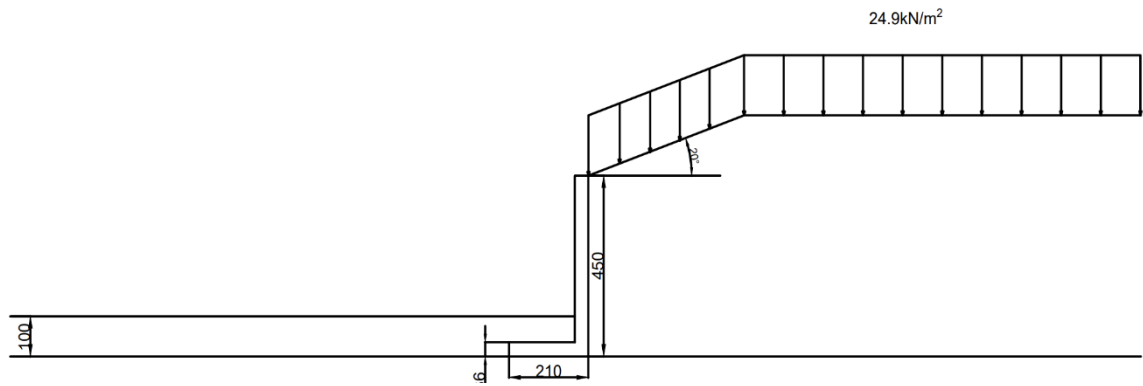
Geometry of retaining wall with backfill slope 20°
